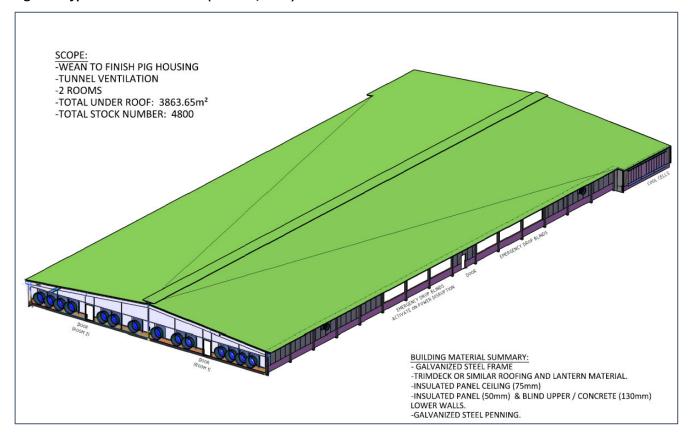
Overview Plan of Proposed Sheds (Rivalea, 2025)
